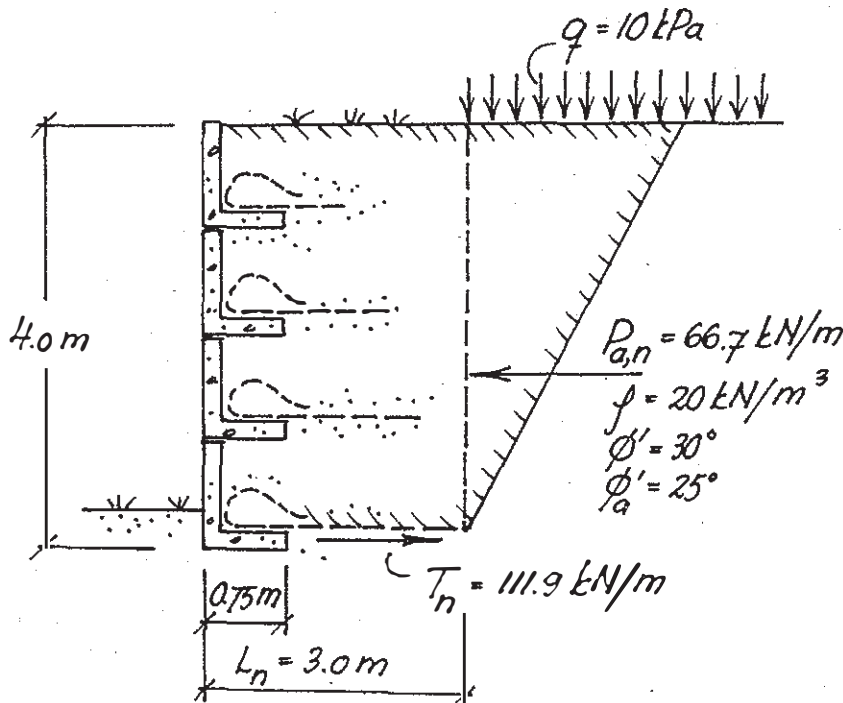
Design of a 4 m high fabric reinforced retaining wall - Sliding along base
